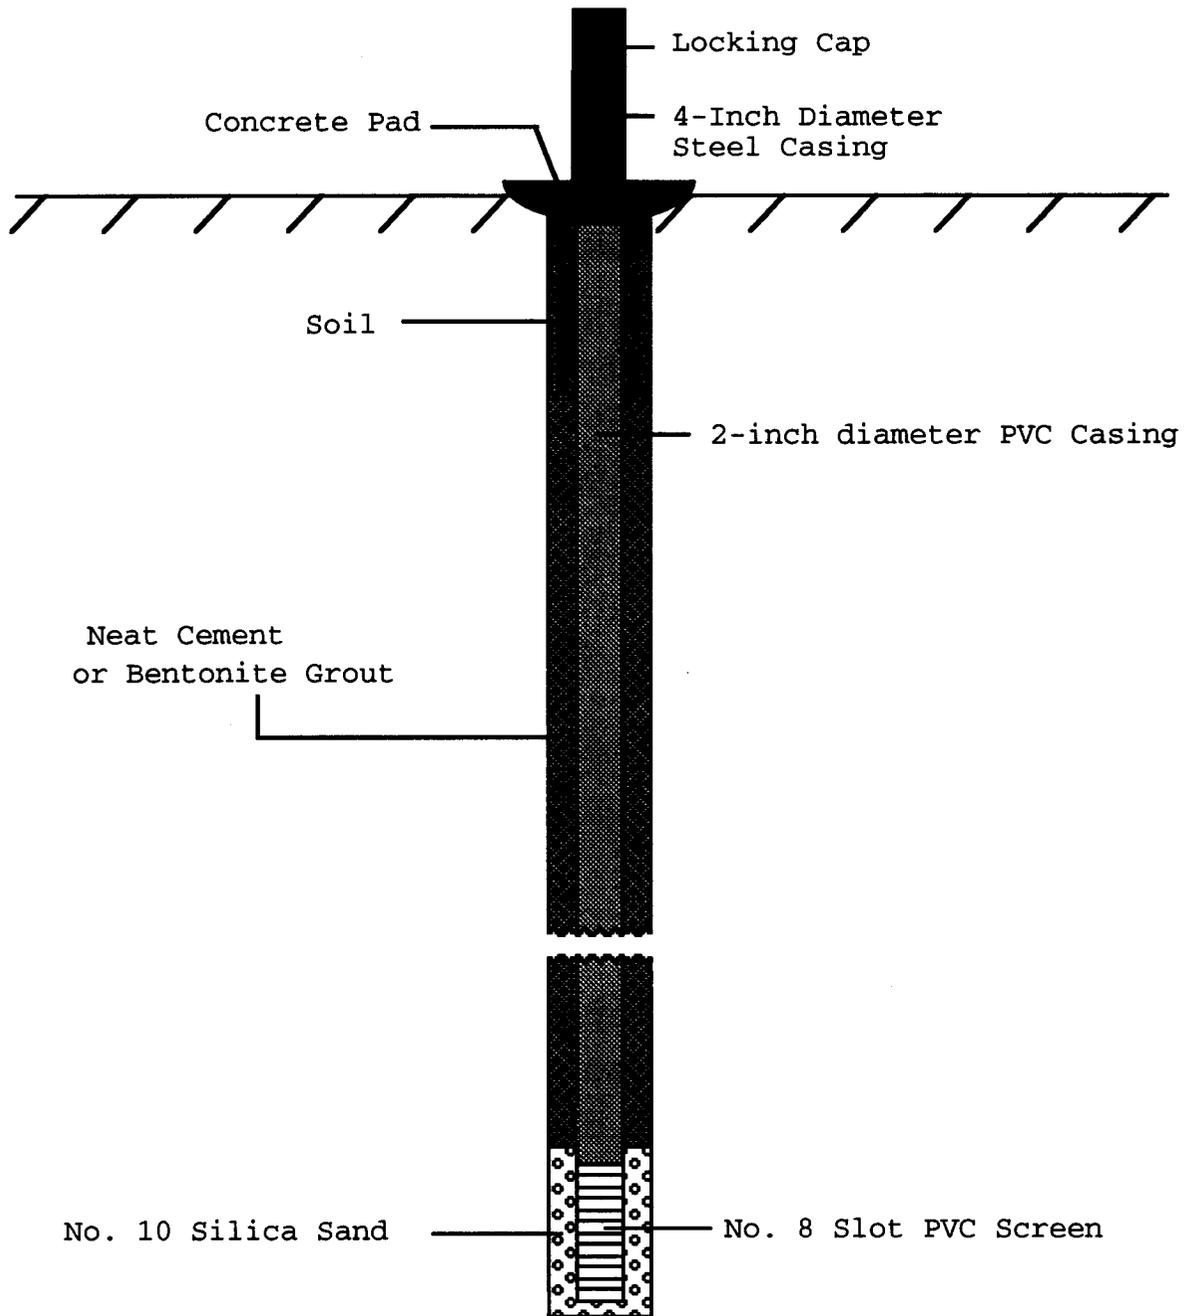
Construction design used for monitoring wells installed at the Beach landfill.
